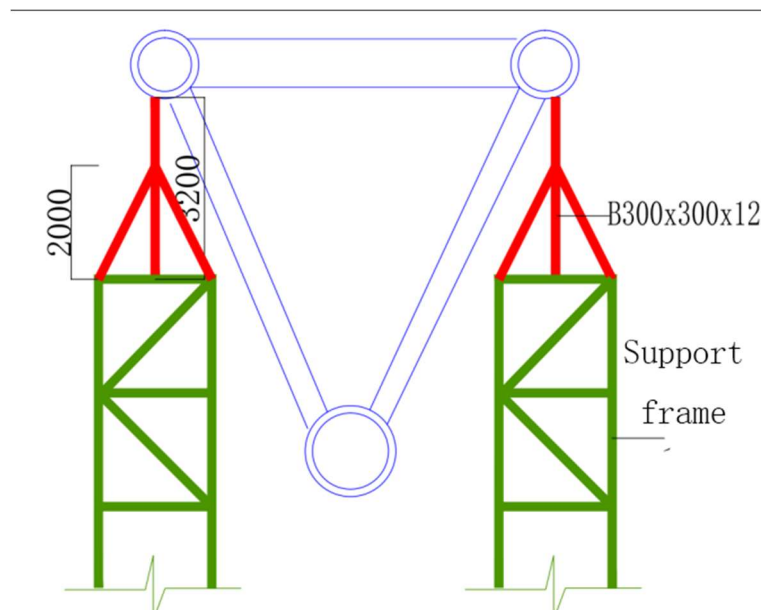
Schematic Diagram 2 for Top Connection of Roof Support Frame of Double deck Exhibition Hall
